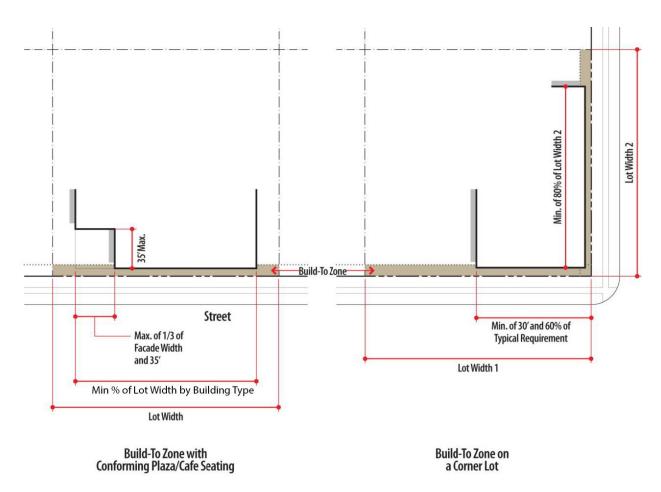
D-1 Build-to zone with allowed plaza (left) and on corner lot (right)
